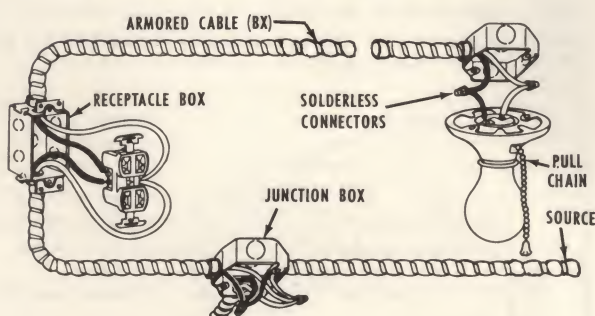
OUTLET AND LIGHT ADDED FROM JUNCTION BOX
